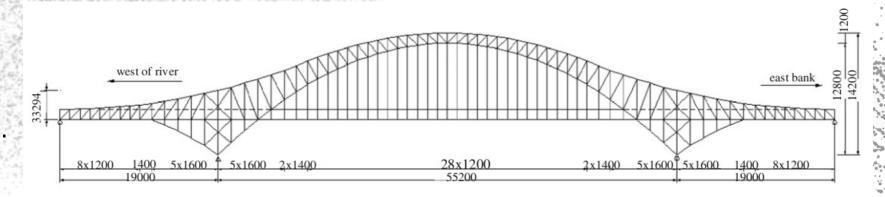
Elevation view of Chaotianmen Bridge (Unit: mm).
